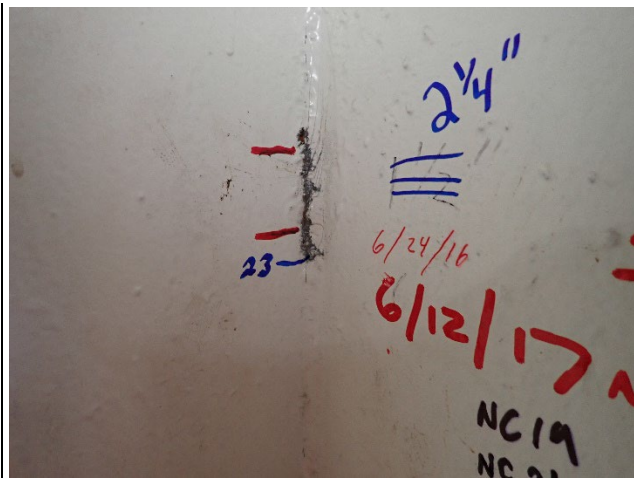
Overall View of Two Cracks On South Cap Web Plate Weld to Stiffener, On West Face of Stiffener Between Girder J and East Bearing.
